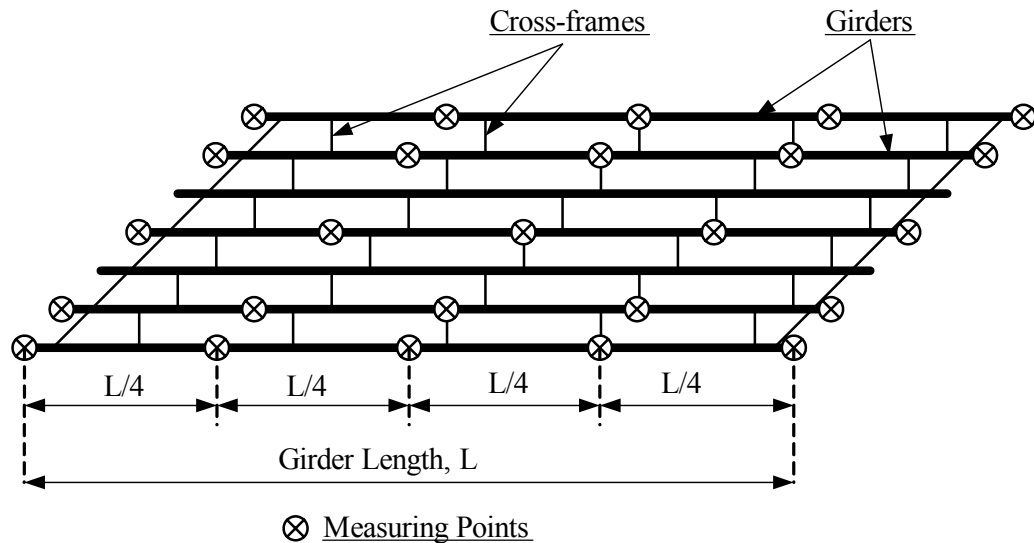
Typical Deflection Measurement Locations of a Single Span Bridge
